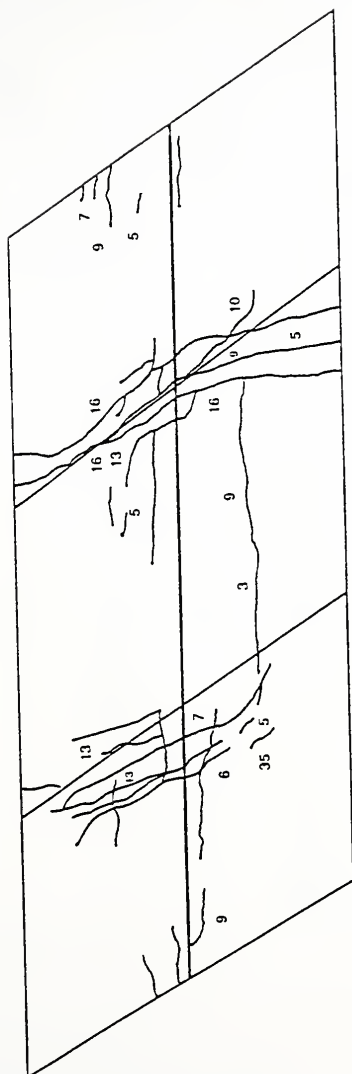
Crack Patterns, Bridge 7-03-6797
